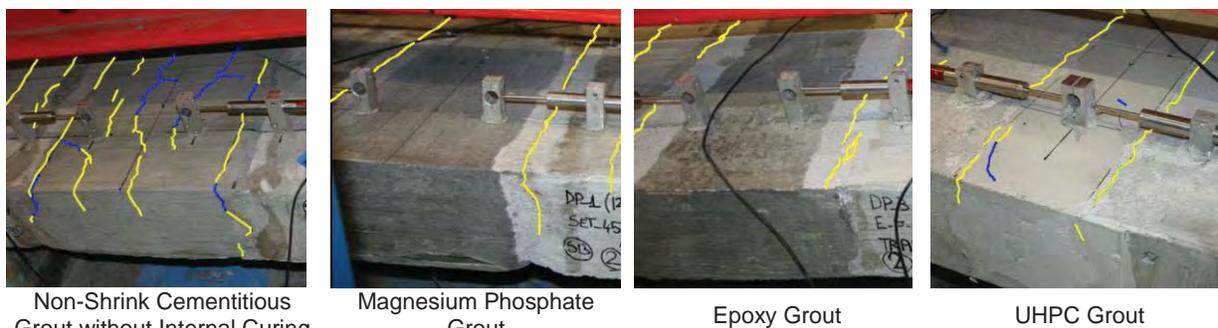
Observed Cracks in the Connection Region after Cyclic Cracking Loading; Blue Lines Denote Shrinkage Cracking, and Yellow Lines Denoted Cracking Caused by Cyclic Loading
